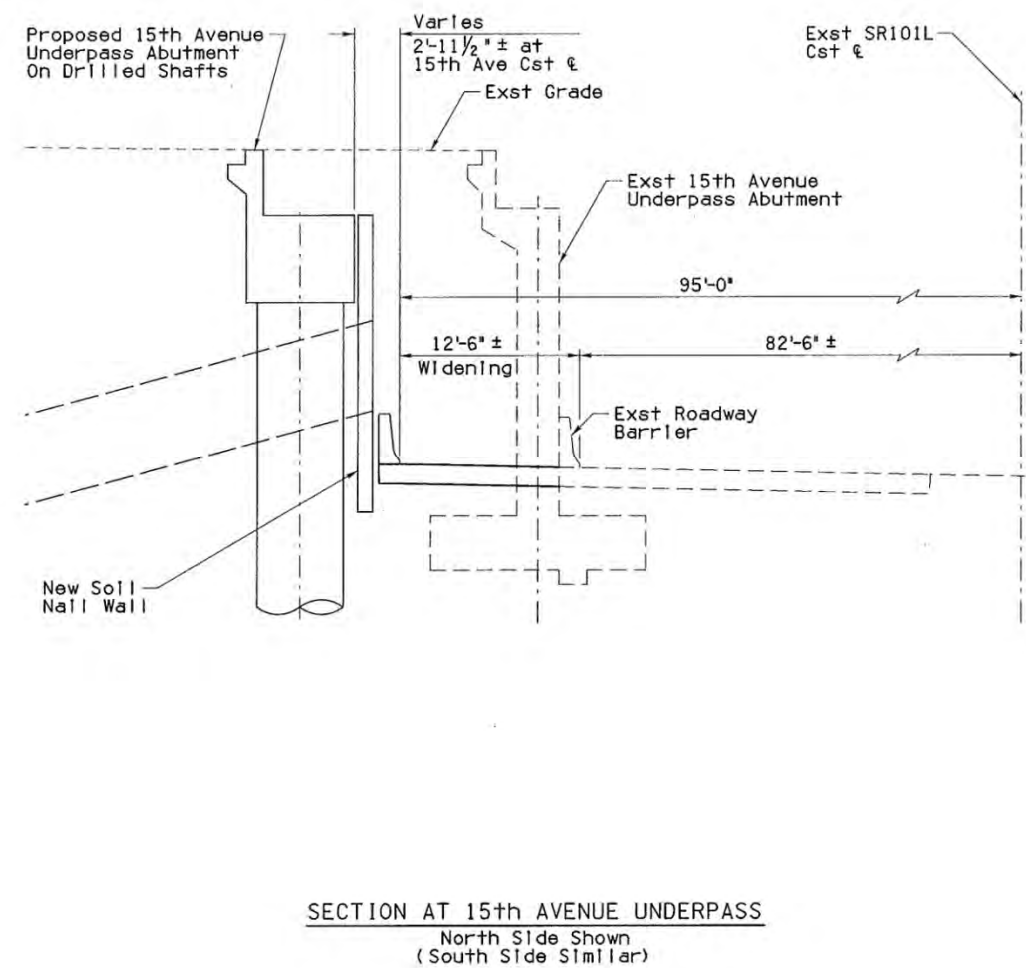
15<sup>th</sup> Avenue Underpass Replacement Section
